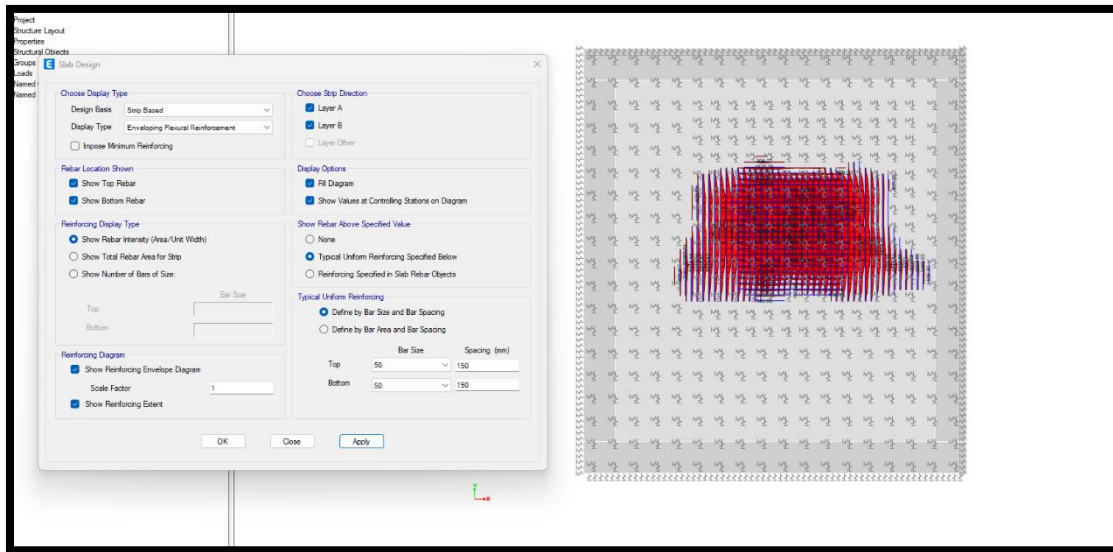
Flexural Reinforcement for the Whole Footing
